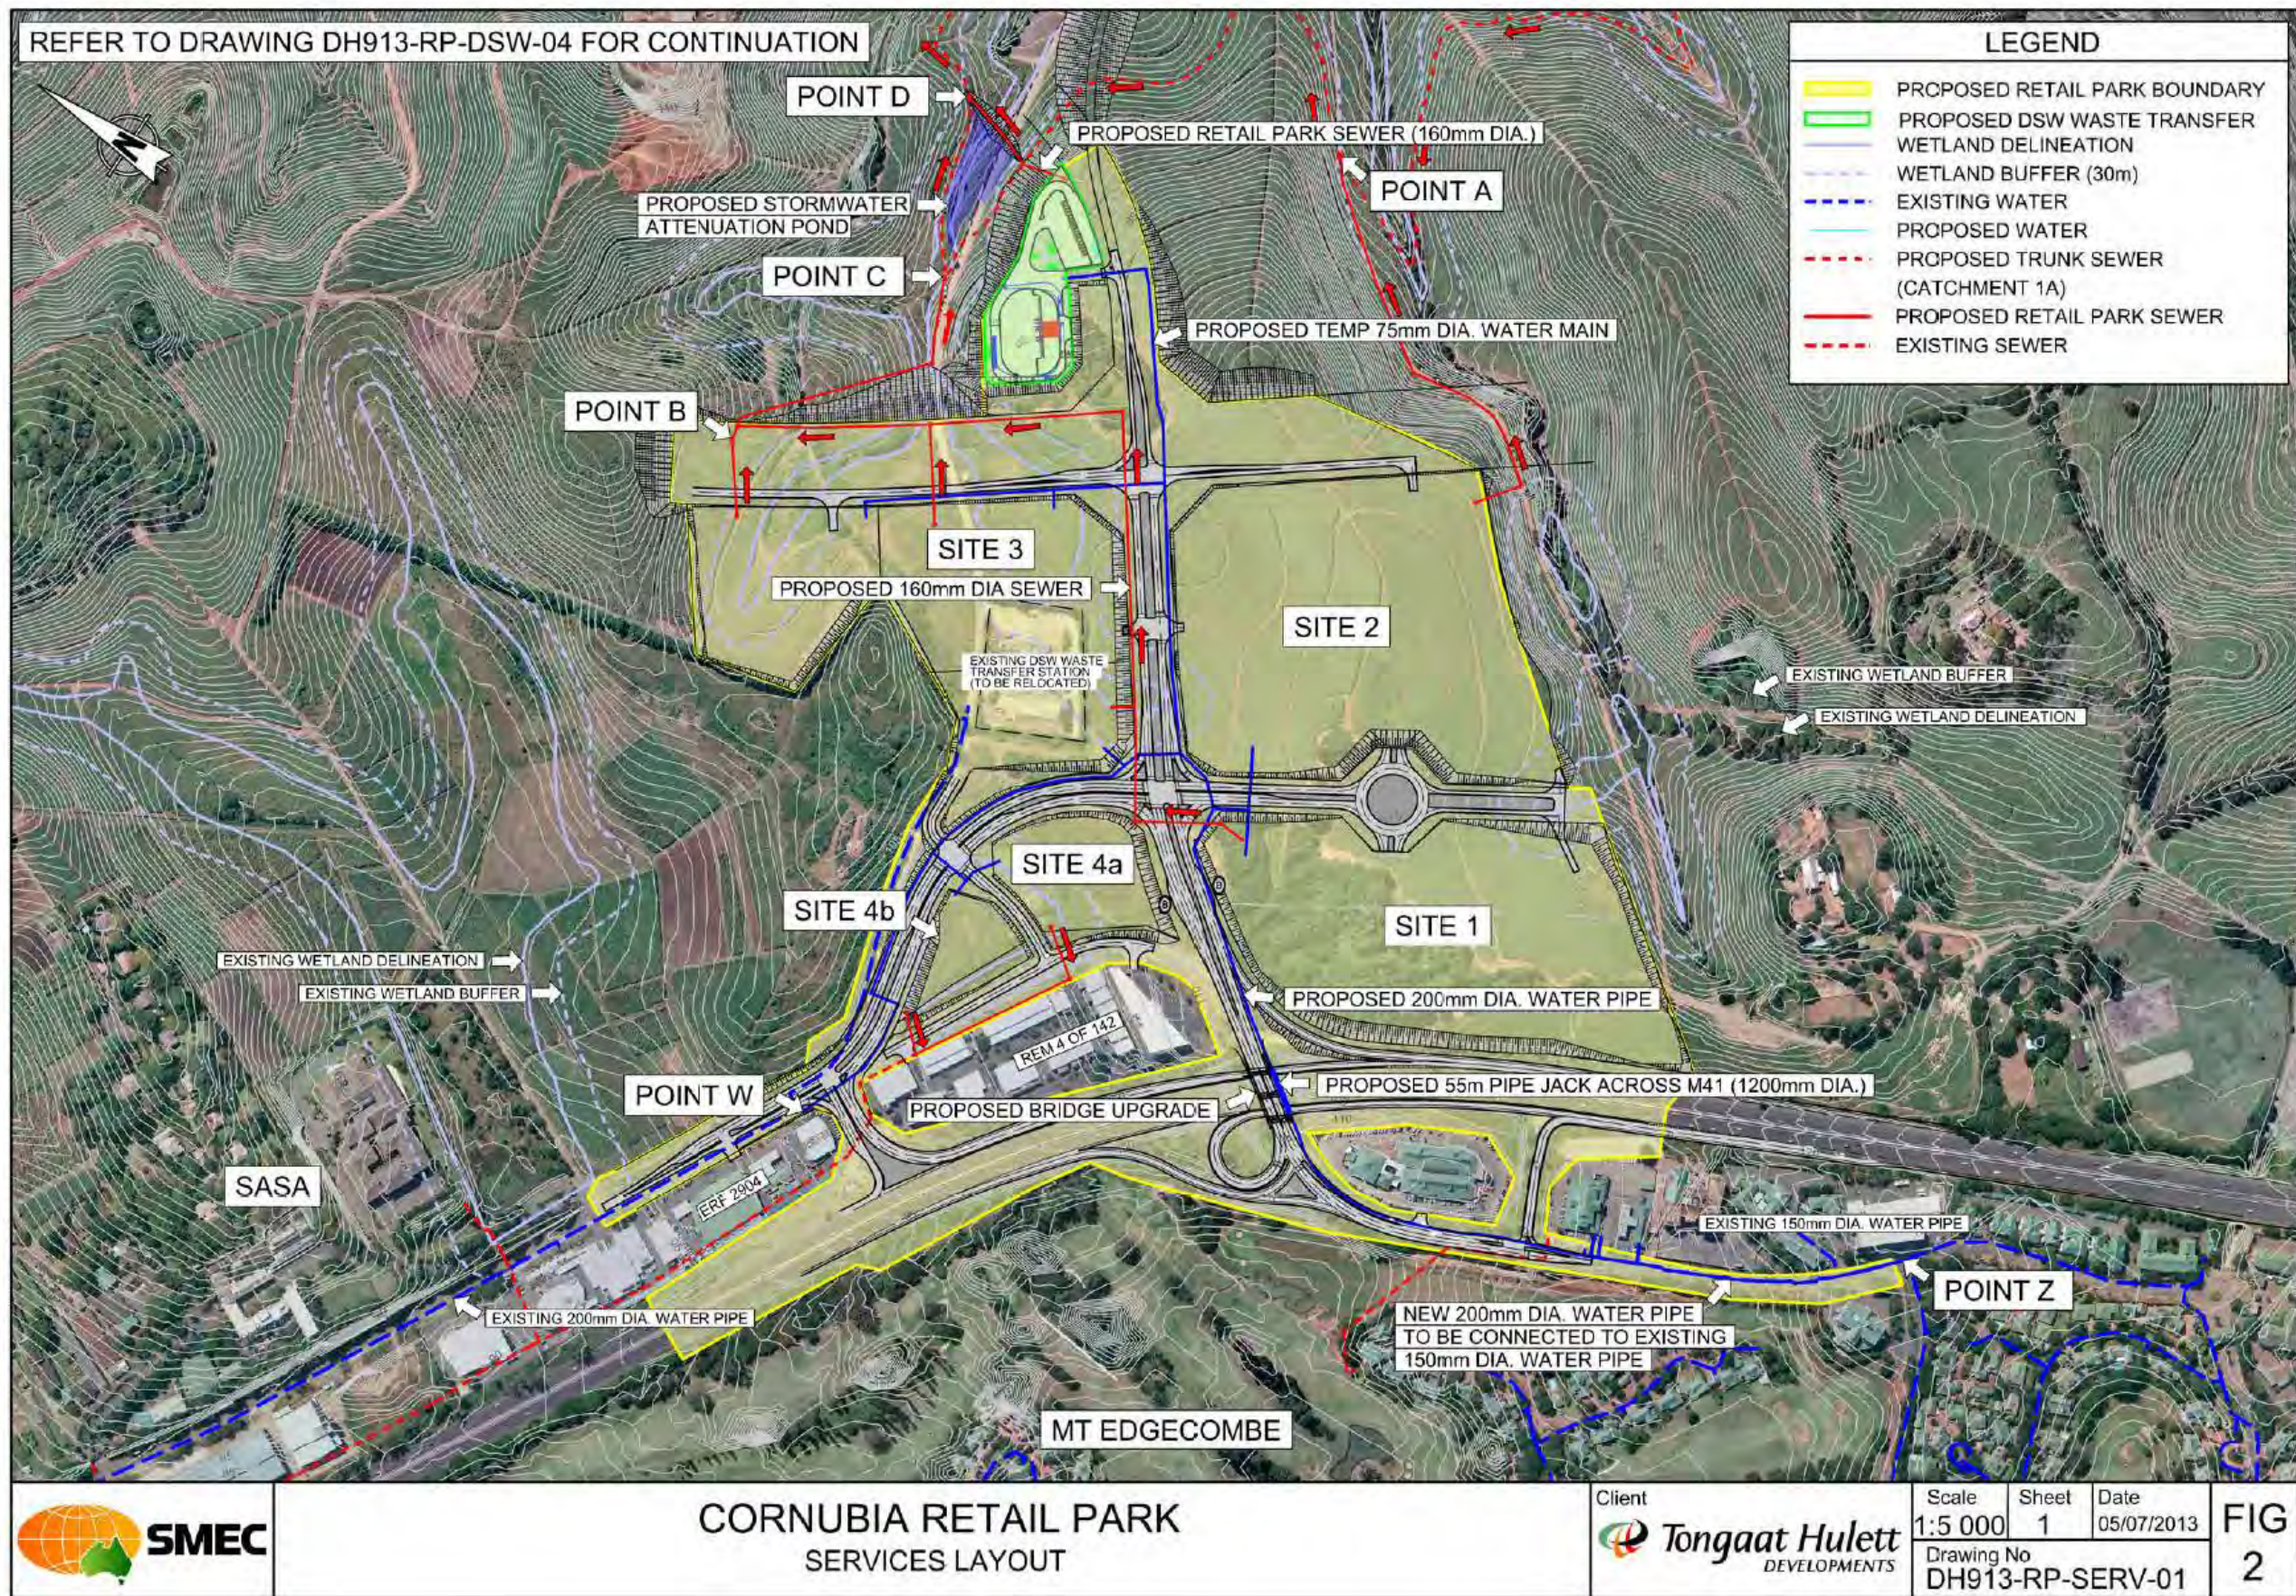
Layout of Alternative Site 2 for the Cornubia Retail Park
